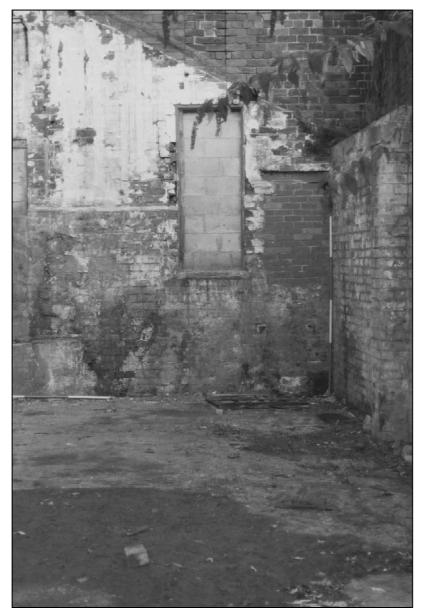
Detail of blocked door and adjacent blocking, west elevation of machine shop (film 46.5)
